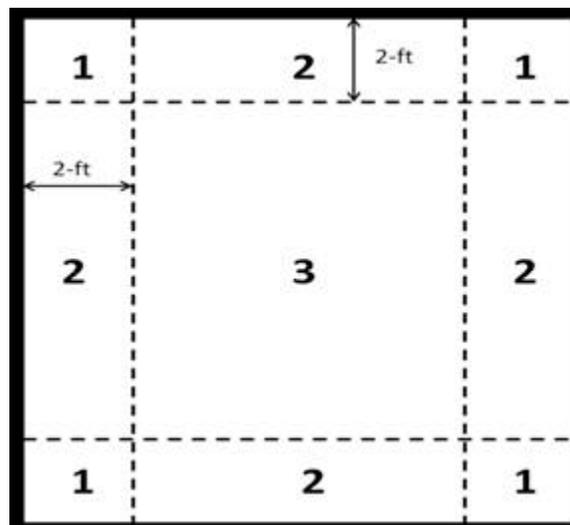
Typical slab layout showing the three locations (1: corner, 2: joint, and 3: interior).
